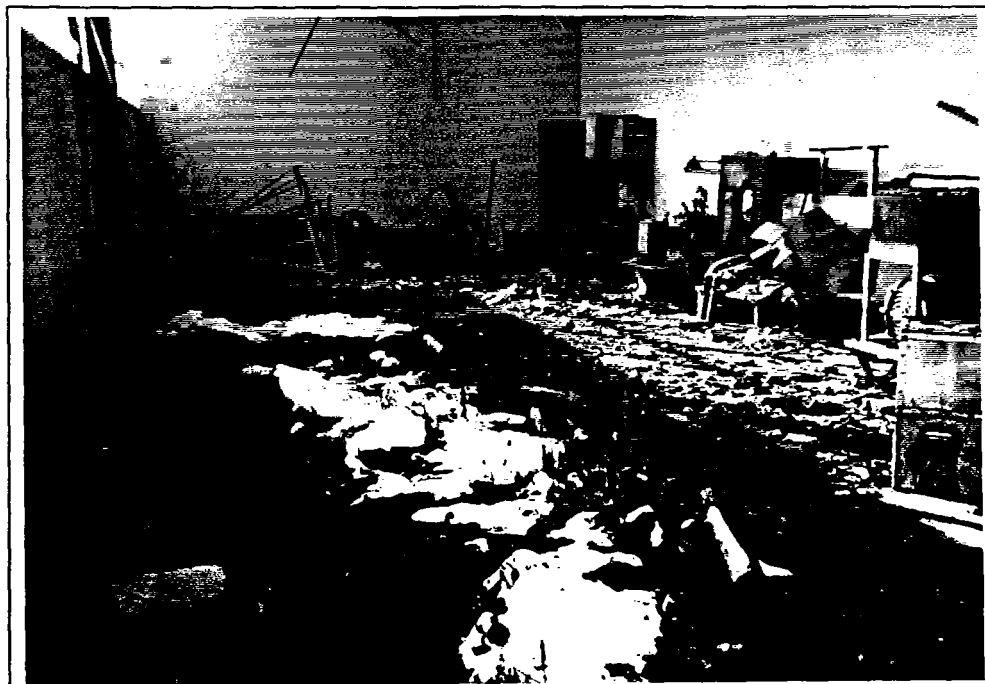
Building 41 - East side of building where water intrusion has caused collapse of non-asbestos plaster ceiling (Sample No. 1-029), non-asbestos concrete roof panels (Sample No. 1-030), and non-asbestos roof flashing material (Sample No. 1-031).
